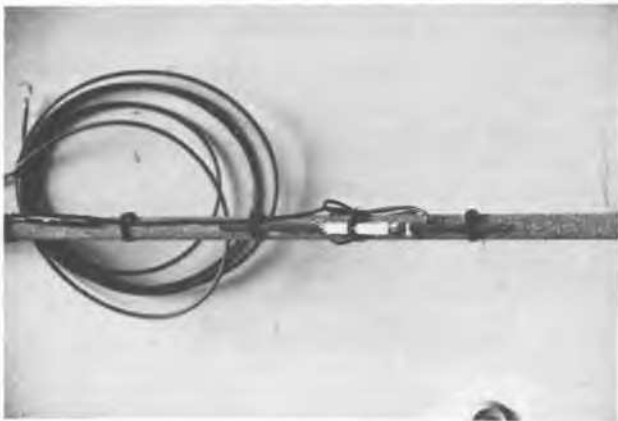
Strain-gaged bar mounted on the steel reinforcement tube
